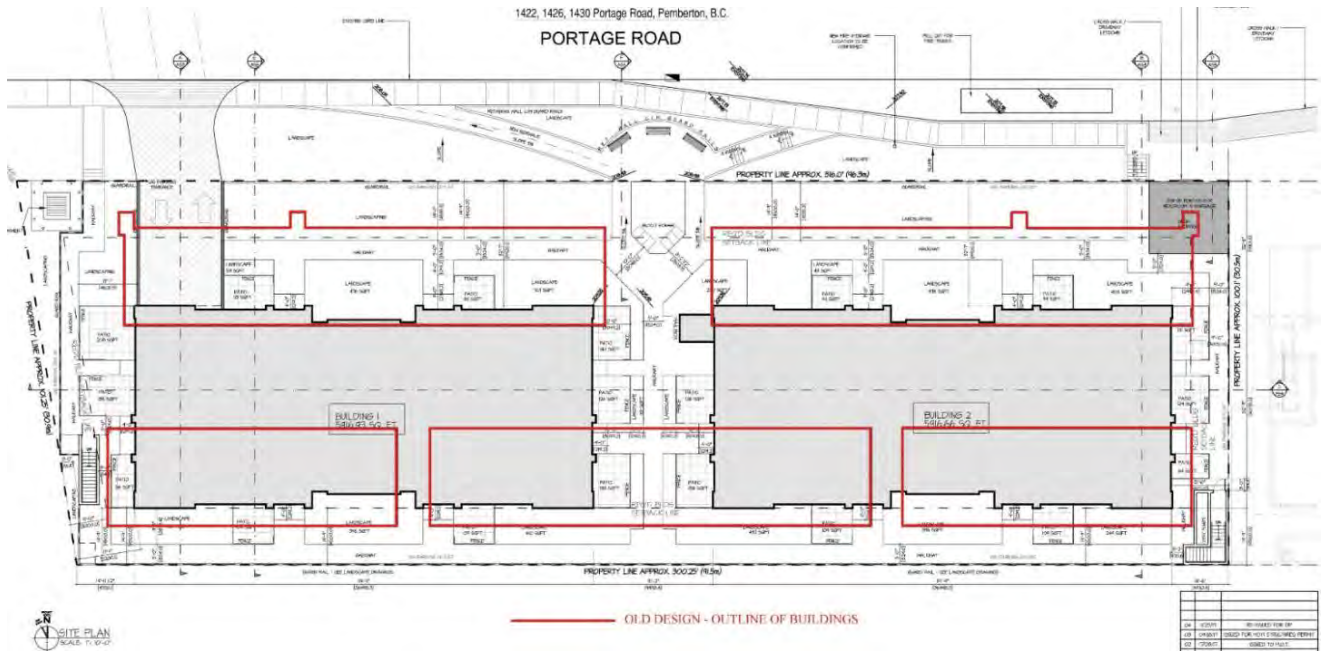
Outline of Buildings on Site Plan: New Design vs. Old Design (red outline)
